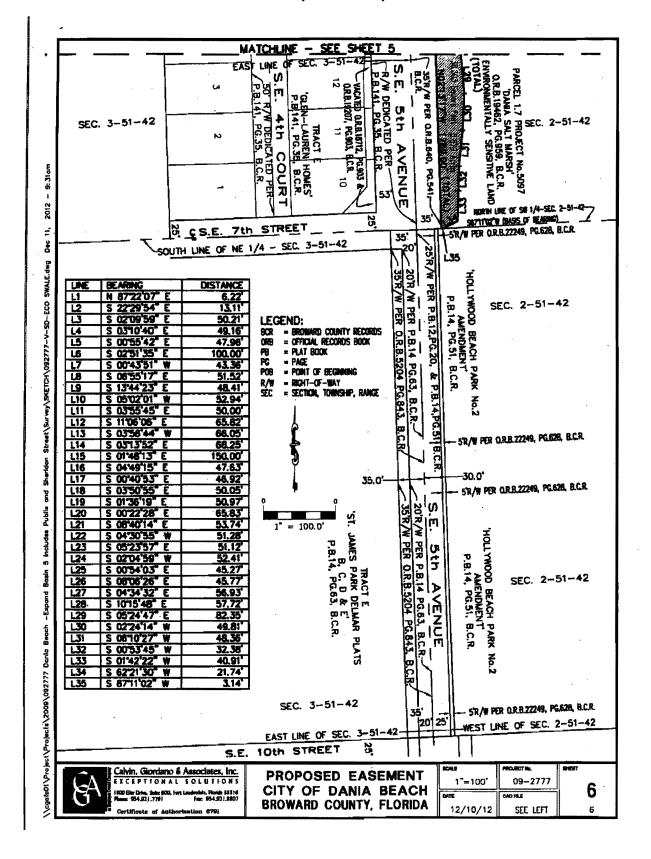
EXHIBIT "C" DESIGN PLANS FOR STORMWATER RETENTION SWALE
